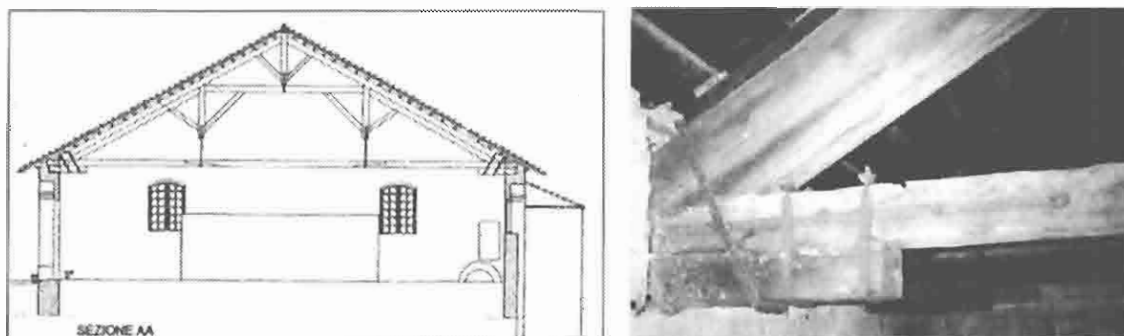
The typical truss: the two principal rafters are held by a main horizontal tie beam and a secondary tie beam (collar), with three posts to support the tie beams
